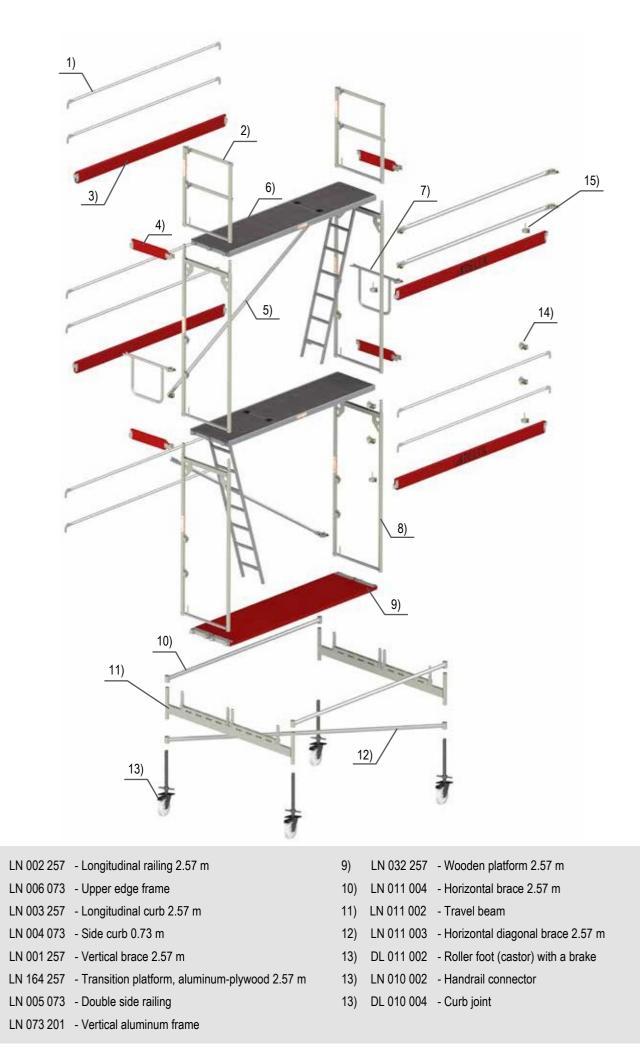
One-sided mobile scaffolding DELTA 73 - Exploded view.
